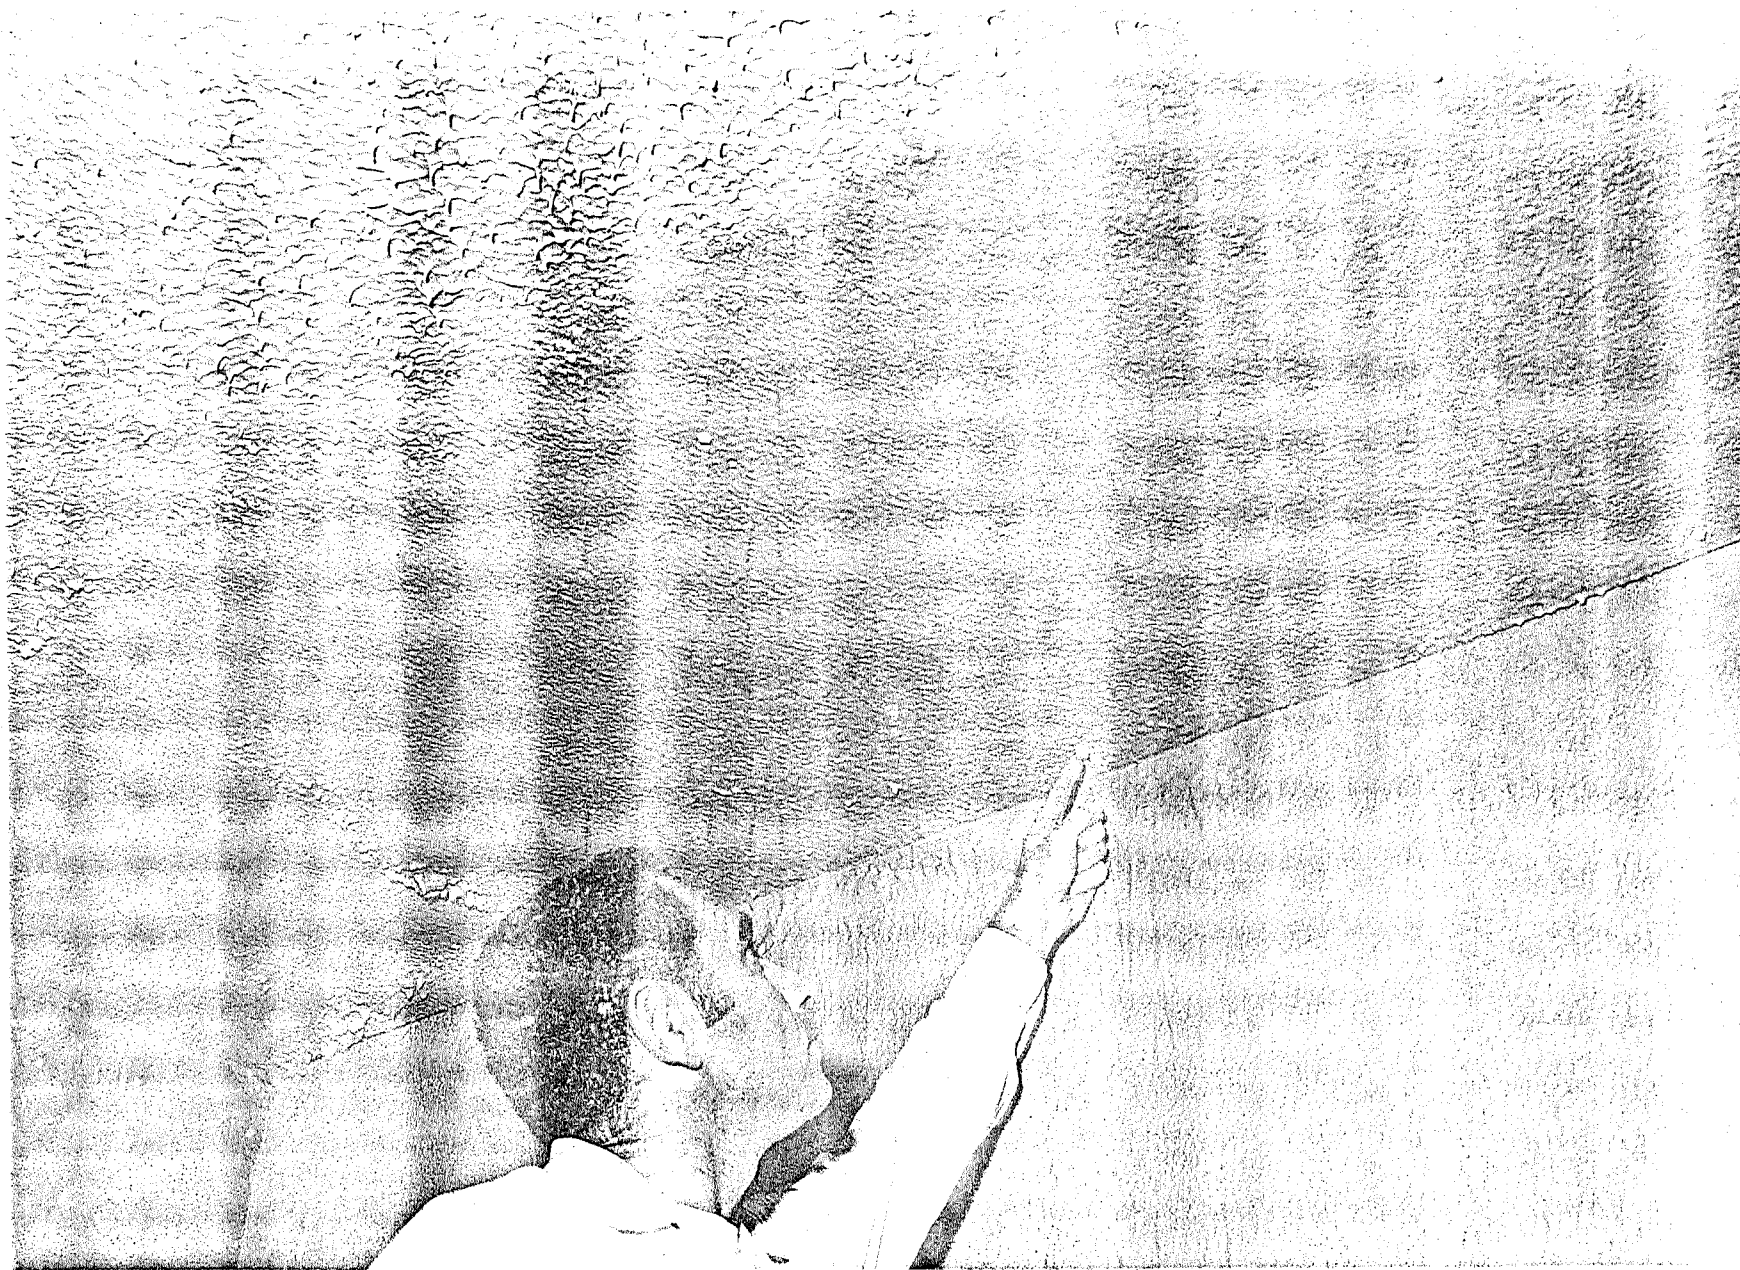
Inspecting A Sprayed-On Overhead Sulfur Based Coating
